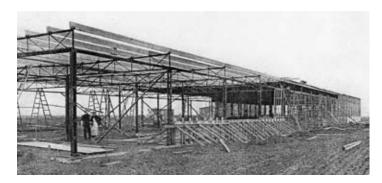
Building 12 under construction, illustrated in *Building* May 1933
